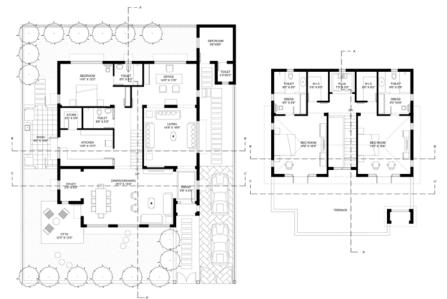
Ground and first floor plan of Kartikay Thakkar house
